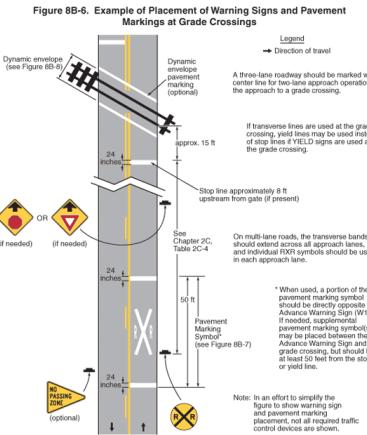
B-6. Example of Placement of Warning Signs and Pavement Markings at Grade Crossings
